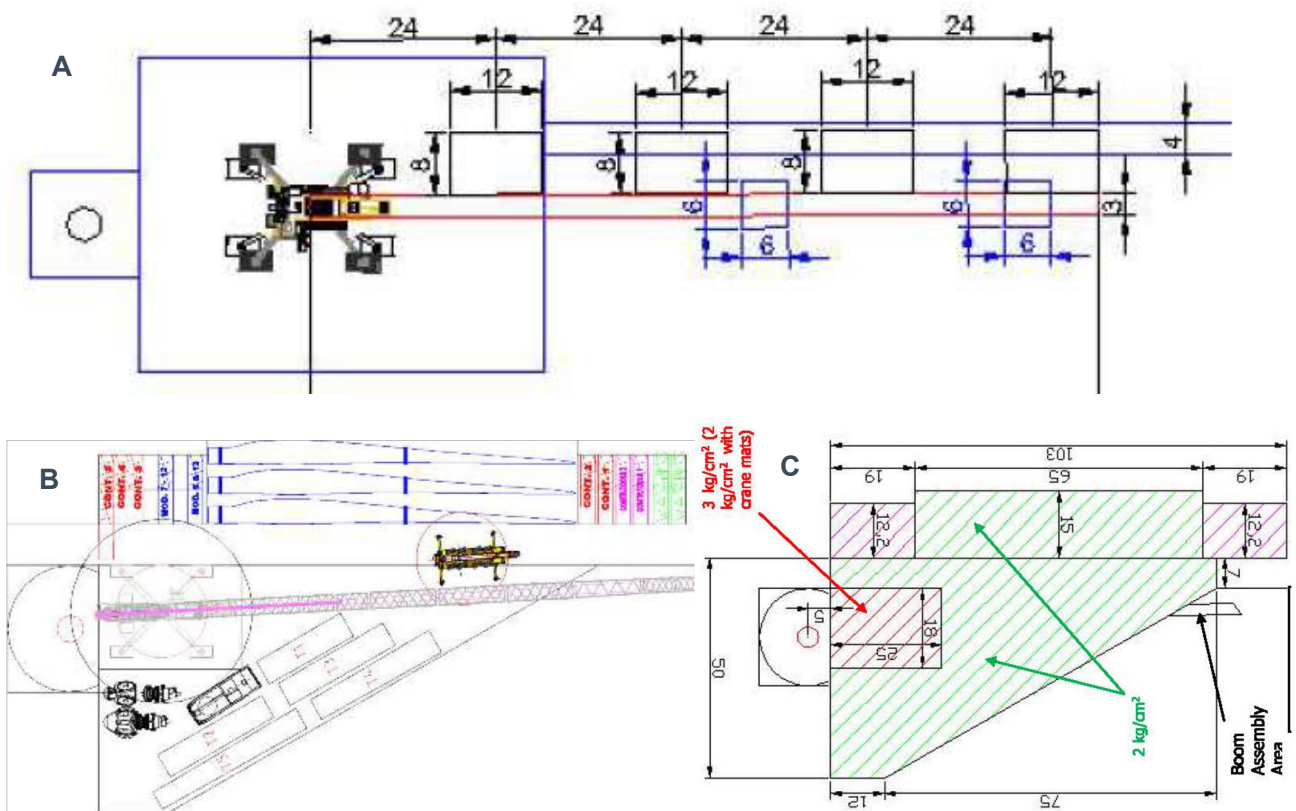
Example of a turbine components ideal arrangement: A. 4m wide access road with 12x8m intermediate crane pads and 6x6m main crane hoist supporting pads next to it. B. Storage layout with blades, containers, generator, main crane hoist, nacelle and tower sections and C. Storage dimensions, total 0.4ha.
